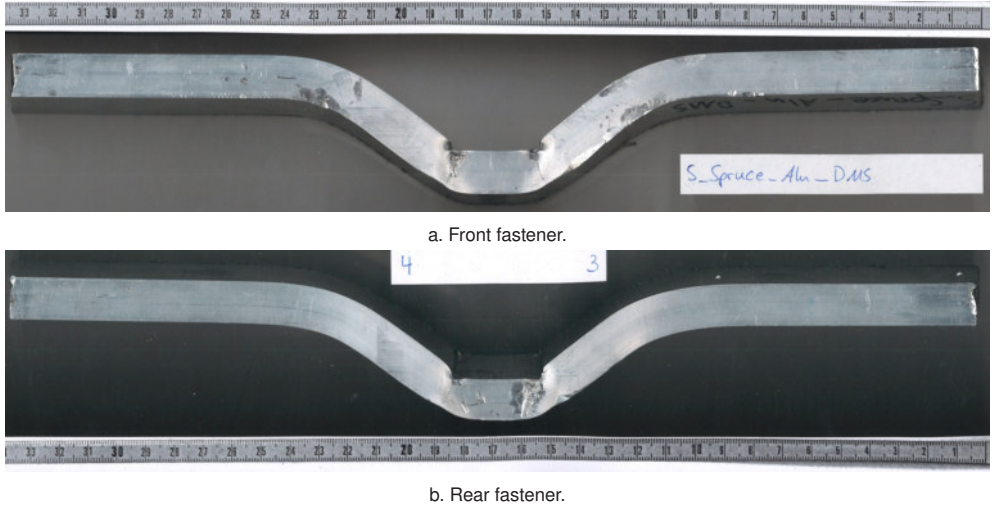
Aluminium fasteners taken out of timber-to-steel connection with spruce glulam.
